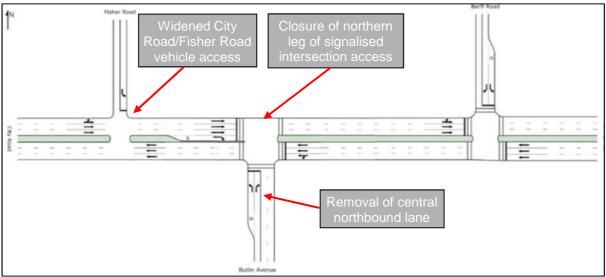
Proposed City Road/Butlin Avenue Intersection Layout (source: Applicant)
